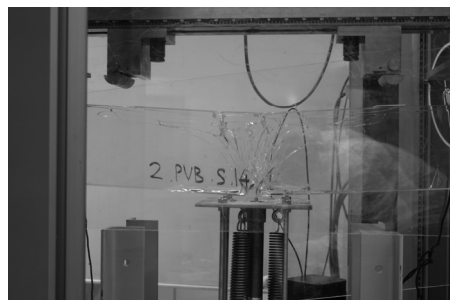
Typical final failure in 2.PVB.S specimen (after resistance test on specimen with model level II (=III) damage).
